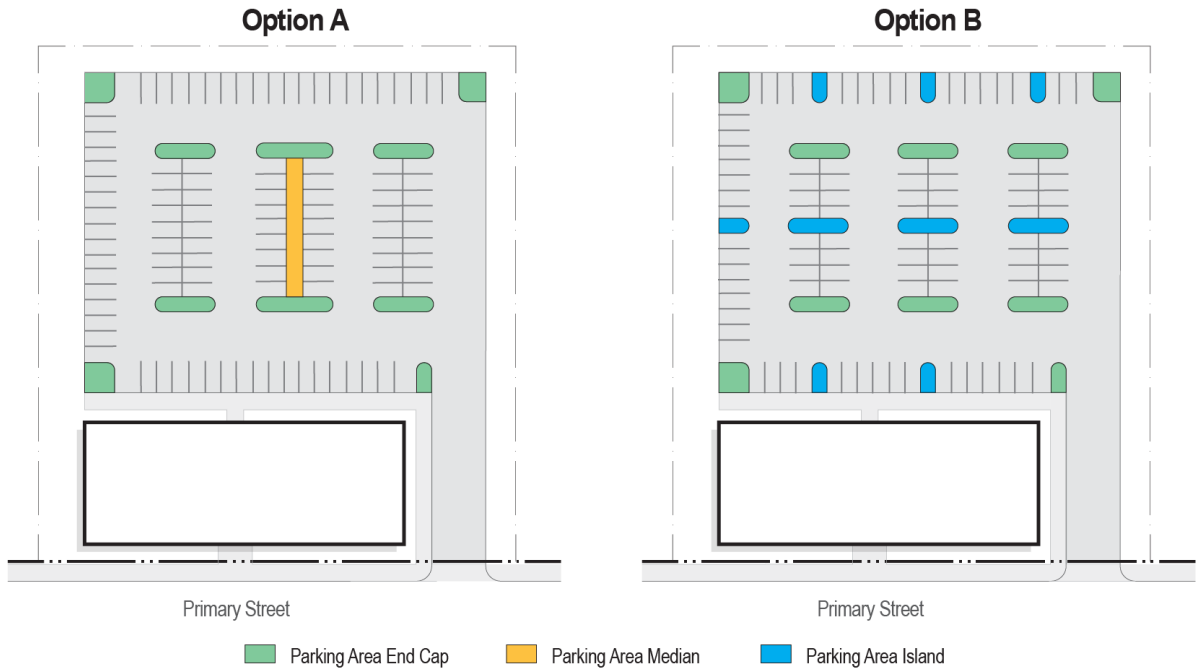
Parking Area Interior Landscape Zone For Parking Areas in Front or Side of Principal Building
